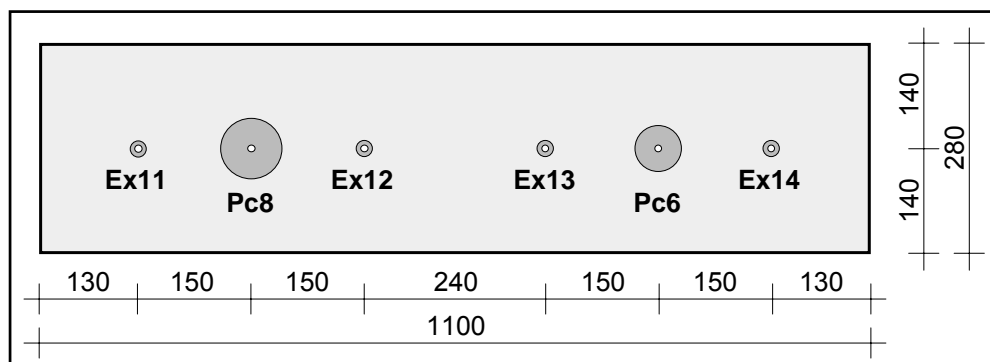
Disposition of sensors in concrete slab used for test Ex1
